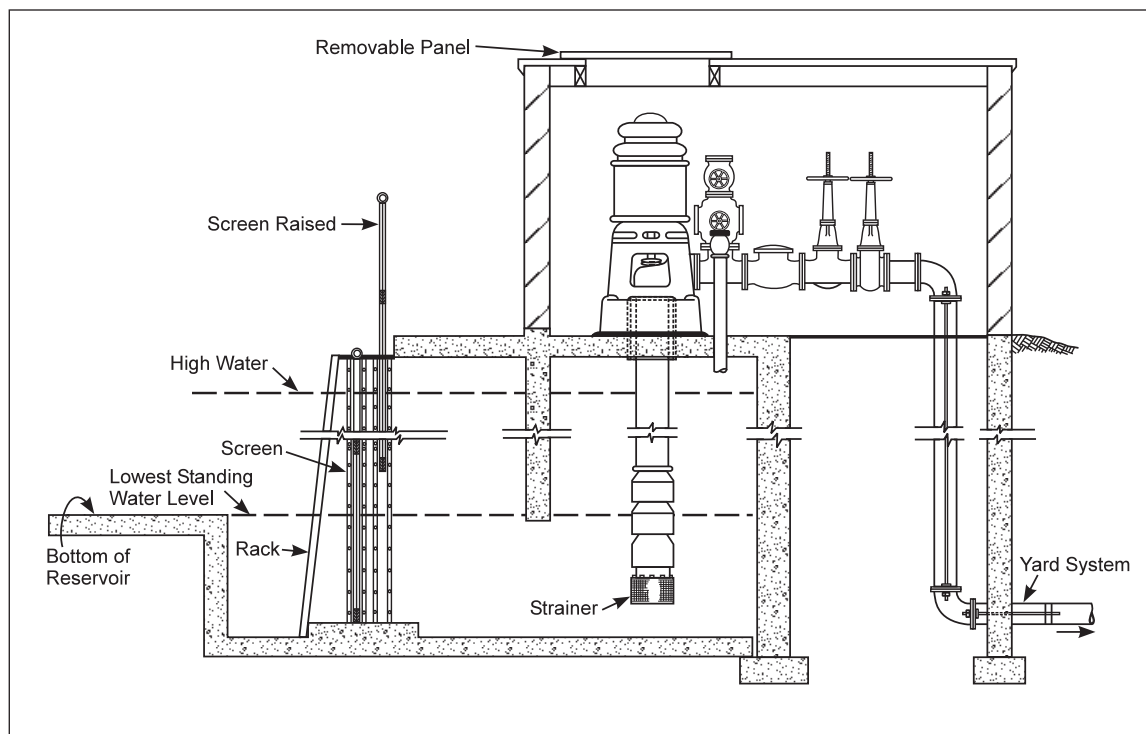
Vertical shaft turbine-type pump installation in a wet pit
